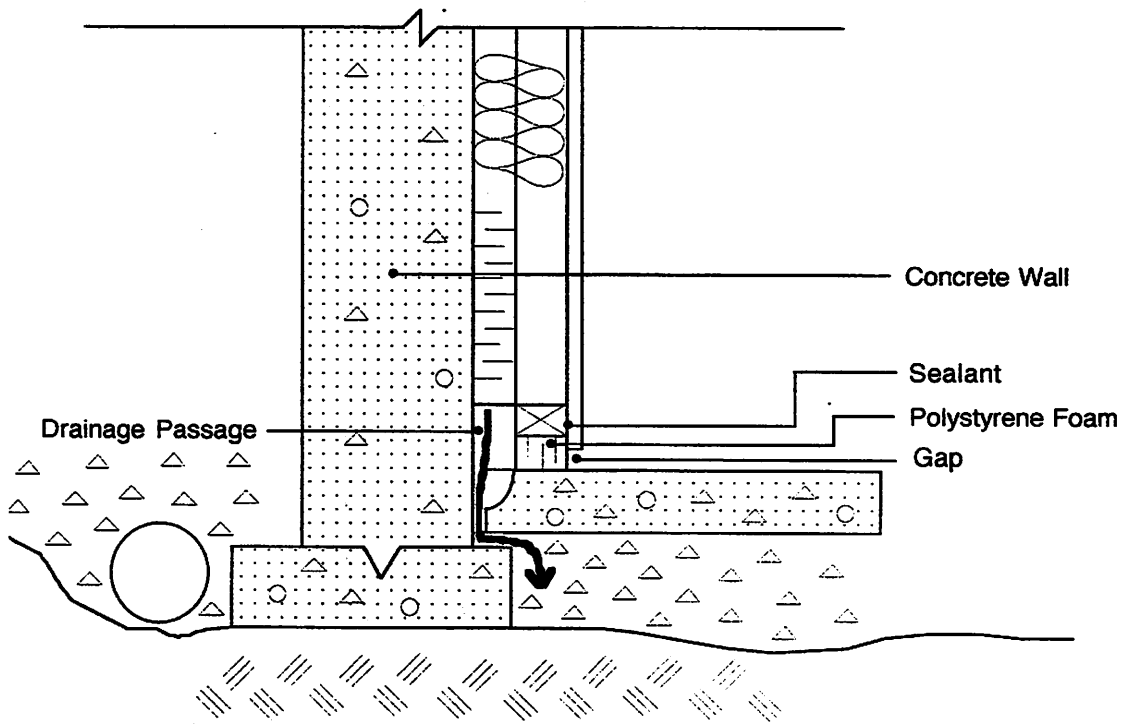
Drainage passage formed between the basement floor slab and wall-to-footing
